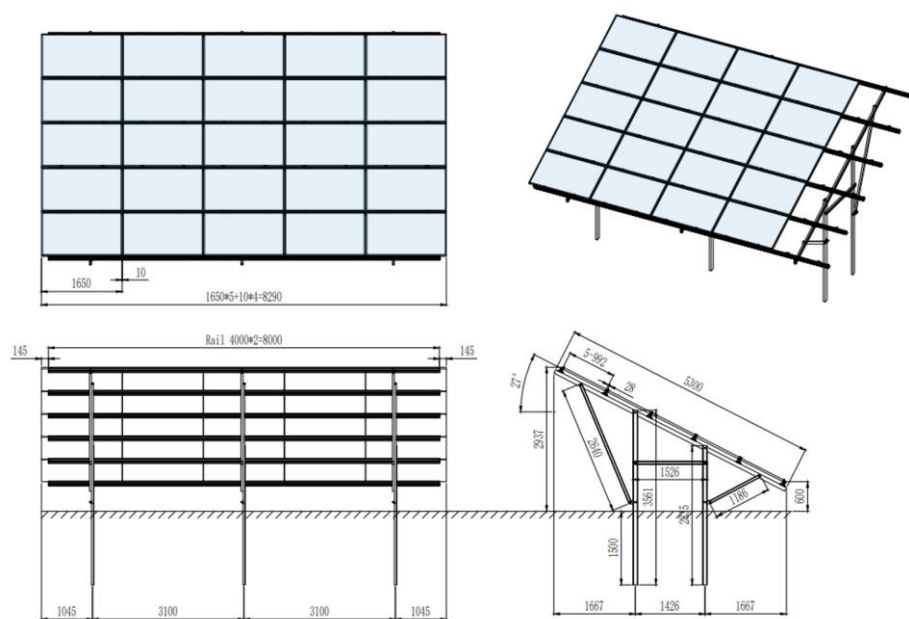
2D drawing of the panel mounting design (all dimensions are in mm)
